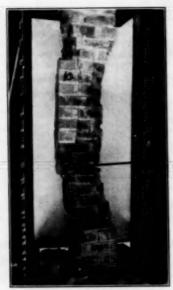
Failure of Chicago Brick Column No. 10. Reinforced with hoops and vertical steel.
